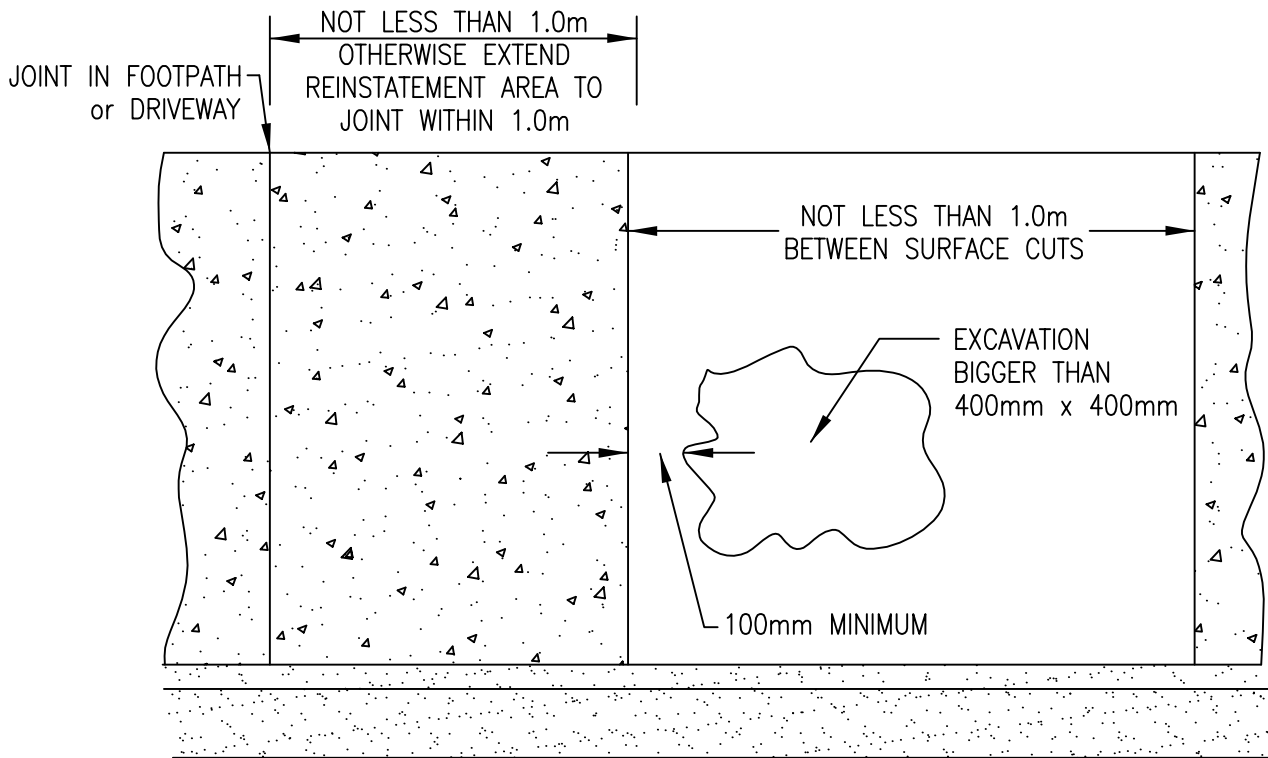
REINSTATEMENT OF CONCRETE PATH OR DRIVEWAY
